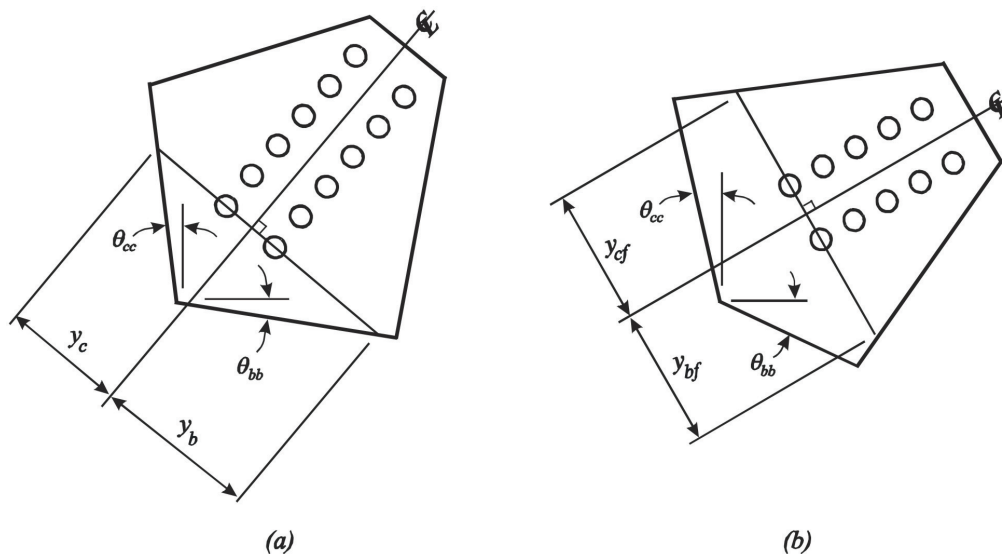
Gusset plates with non-orthogonal column-gusset and beam-gusset interfaces.
